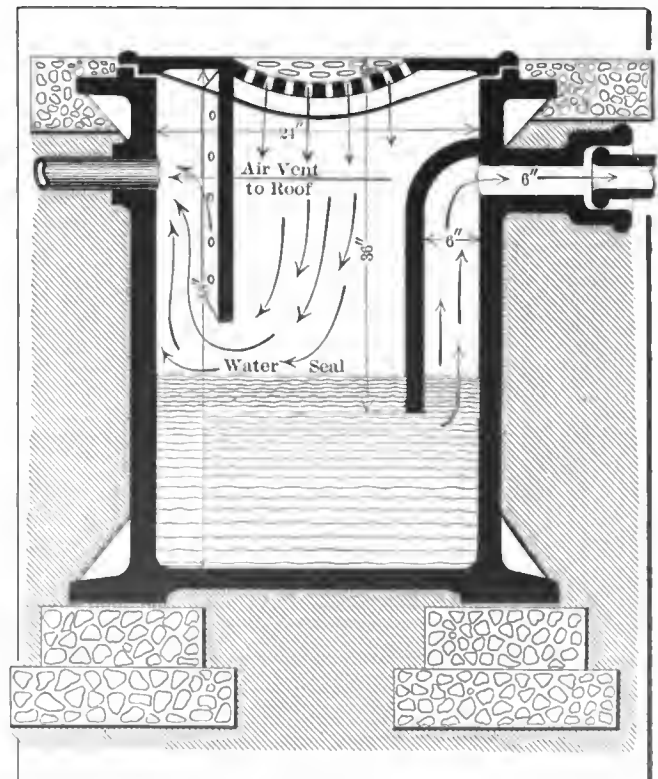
Well hole so shaped as to serve as a safety trap at the sewer opening in a garage, with means for preventing gas from entering the sewer, and a draught pipe to dispose of the gas
